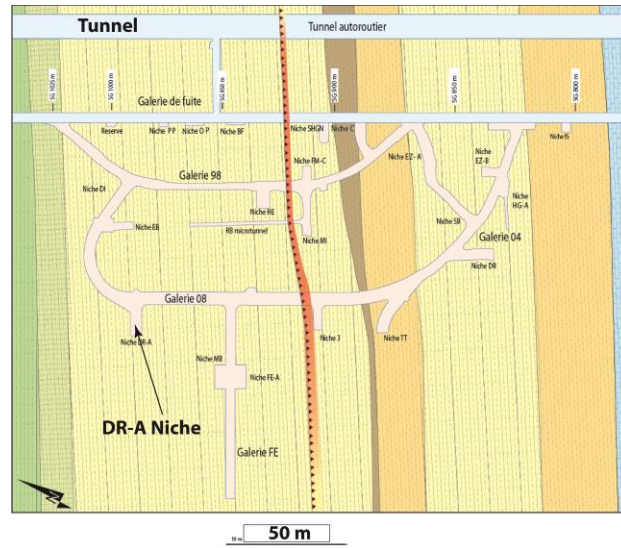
Plan view of the Mont Terri site showing location of DR-A niche.
